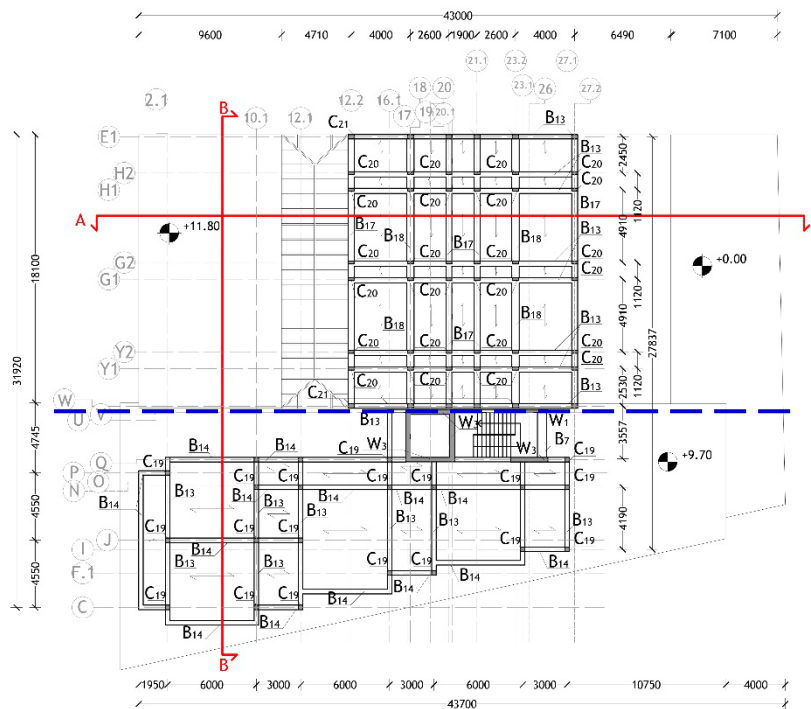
Structural plan of the second and third complete floor of the hotel (heights 14.50 m e 17.85 m from ground level)
